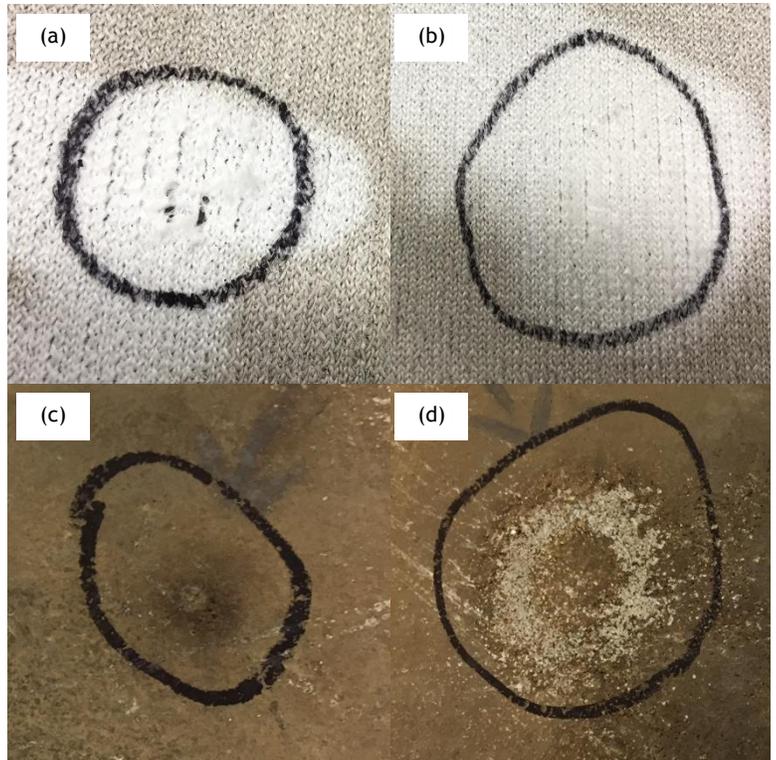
3 minute exposures to 1600 psi pressure washing for (a) CC13 - 1 inch elevation, (b) CC13 - 3 inch elevation, (c) concrete - 1 inch elevation, (d) concrete - 3 inch elevation.
